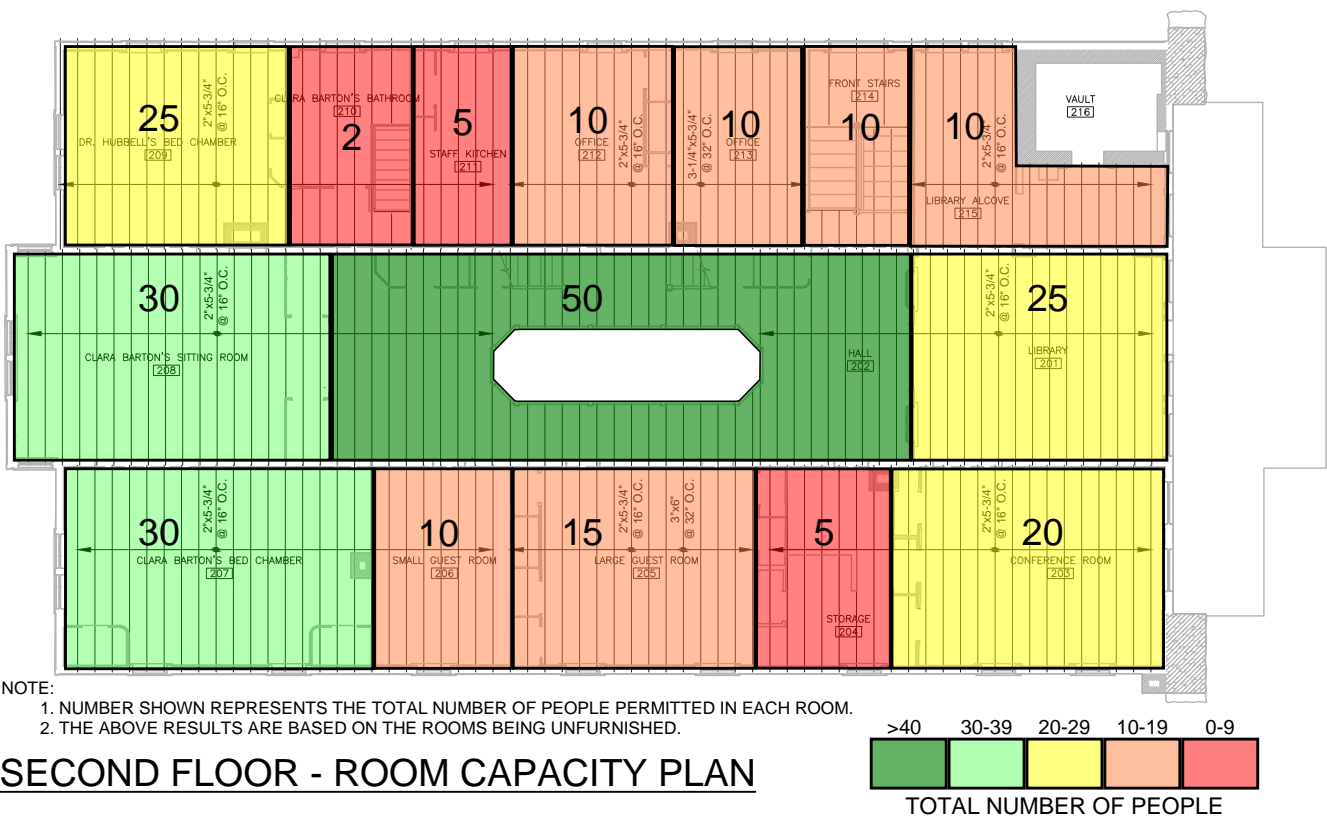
Unfurnished Room Capacity Plan - Second Floor
